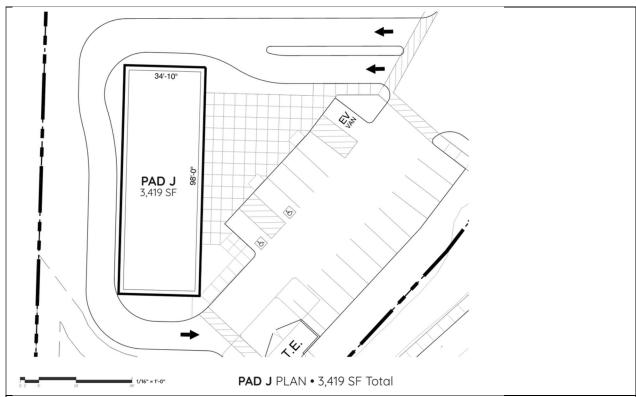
3,419 sq. ft. Proposed Drive Through Restaurant: Site Plan excerpt showing the proposed 3,419 sq. ft. (34 ft.-10 in. x 98 ft.) drive through restaurant, with exterior dimensions labeled
